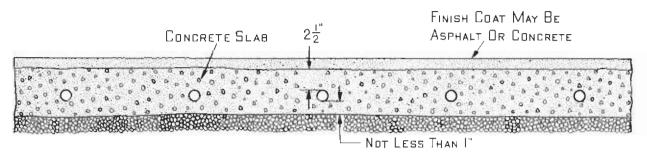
Total depth of concrete and bed of crushed rock or sand to be in accordance with installation requirements. Spacing 3_d-inch pipe on 12-inch centers, 1-inch pipe on 16-inch centers.
